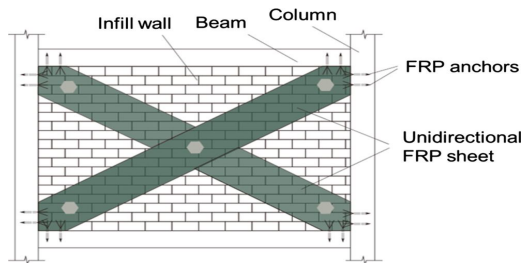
Retrofit of infilled reinforced concrete frames with FRP bracings [1]
